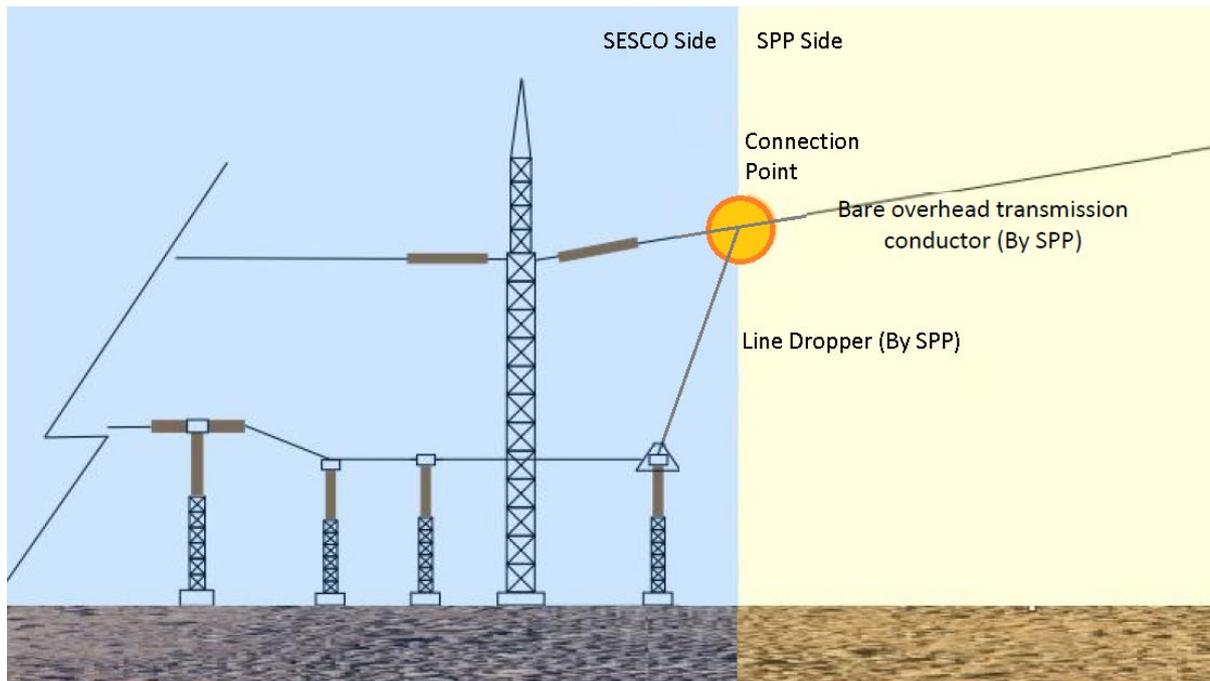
Connection Point at the connector of the down-dropper on the overhead line (OHL)
